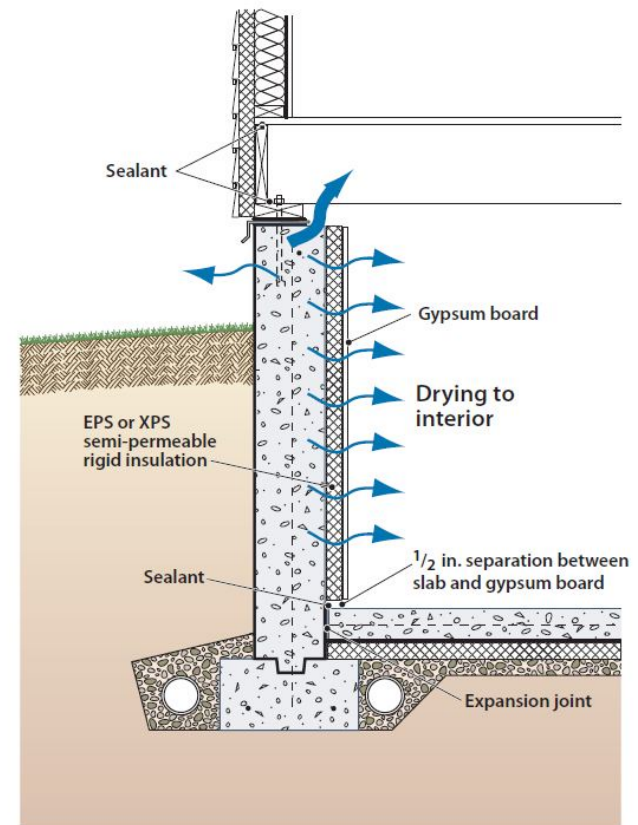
Basement Interior Insulation with EPS or XPS Semi-permeable Insulation on Inside Wall
